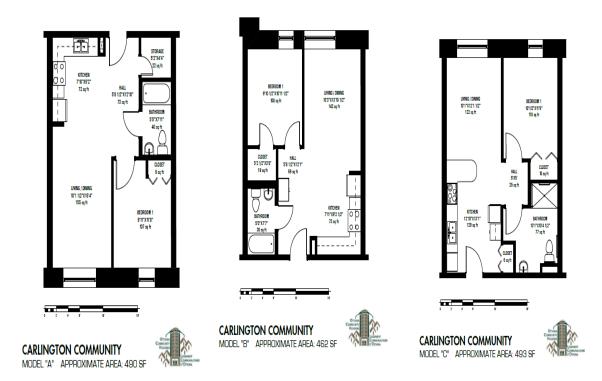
Carlington Community Floor Plans, Source: Ottawa Community Housing
